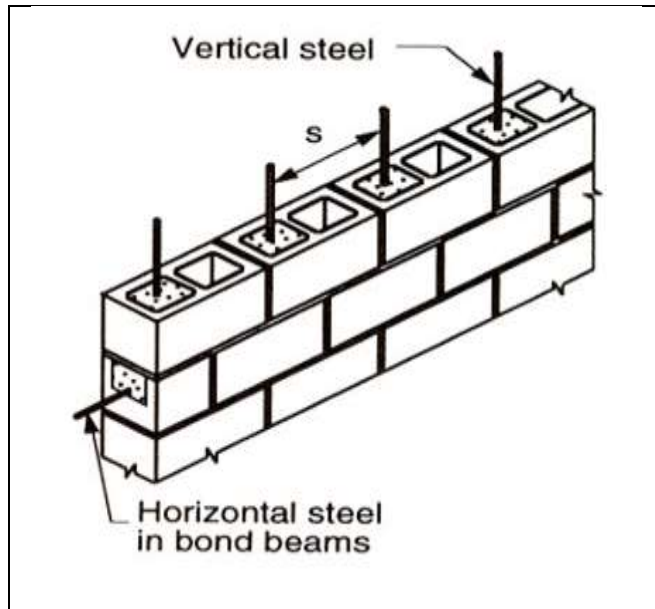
Reinforcement in Partially Grouted Reinforced Masonry Wall
